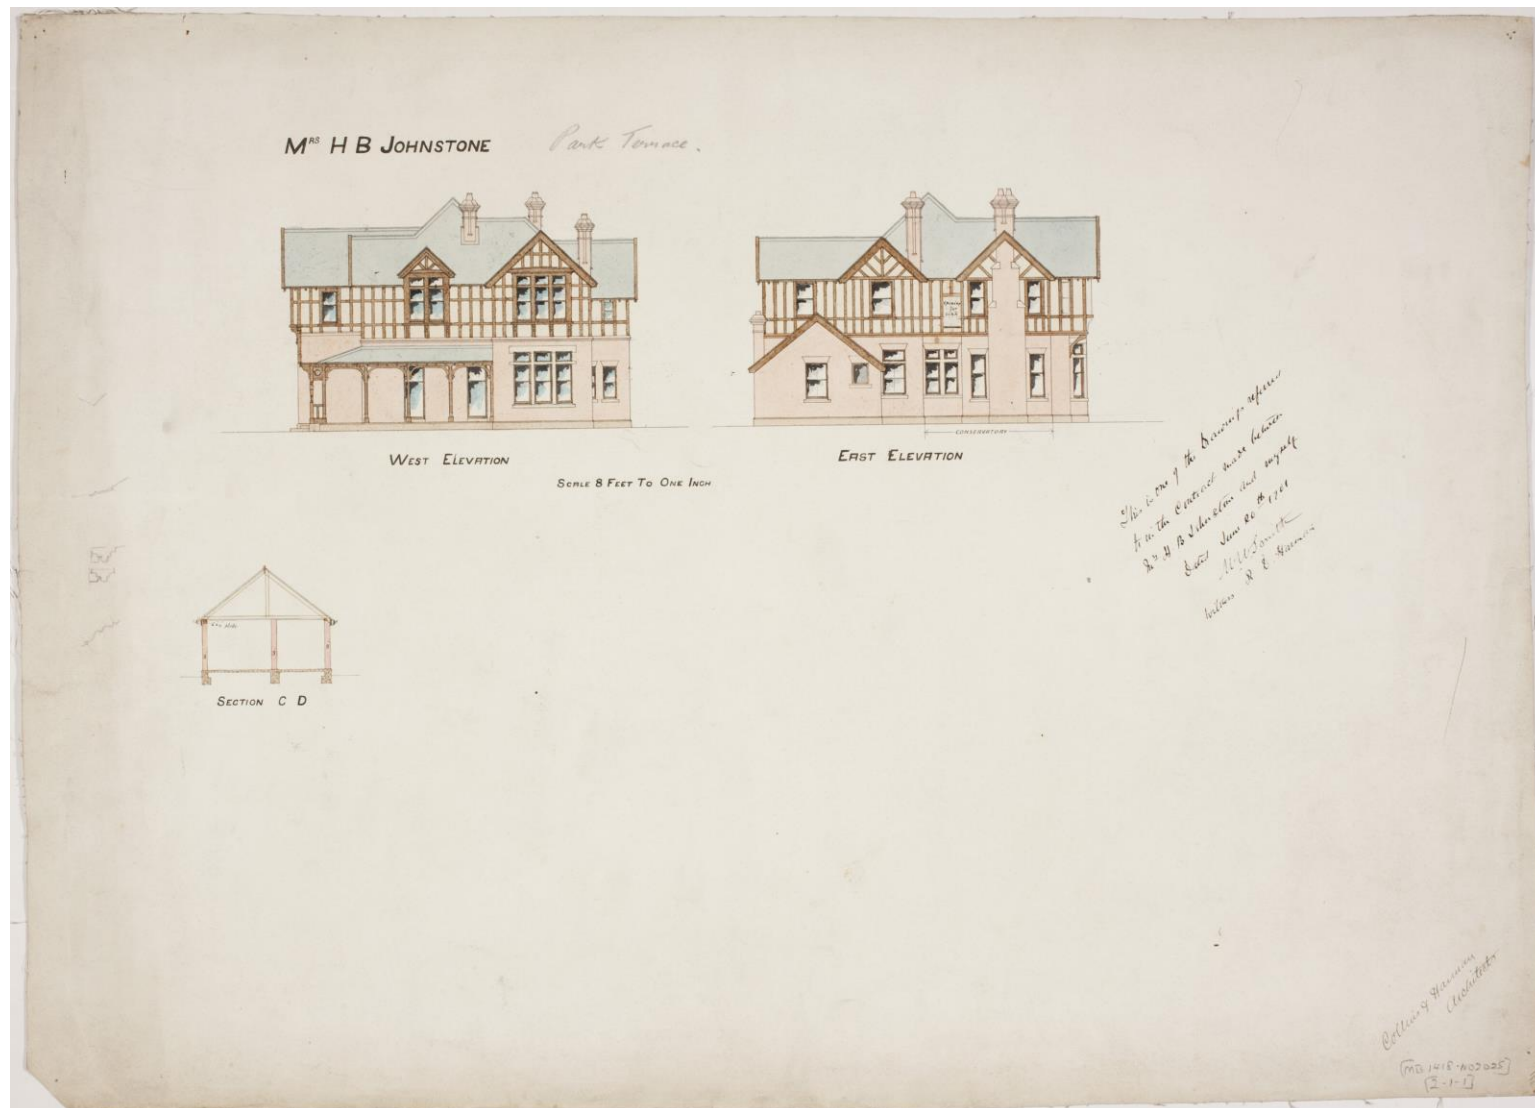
Collins and Harman, Mrs H. B. Johnstone, elevations and section (1902).
